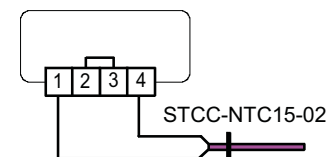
Wiring of floor or duct sensor when using internal setpoint
